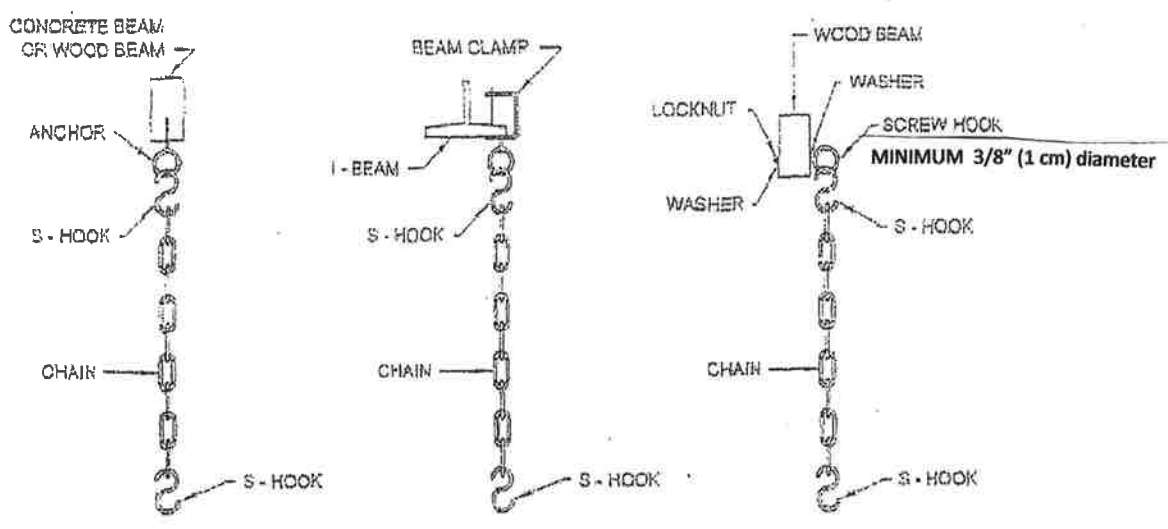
EXAMPLE SUSPENSION DETAILS
